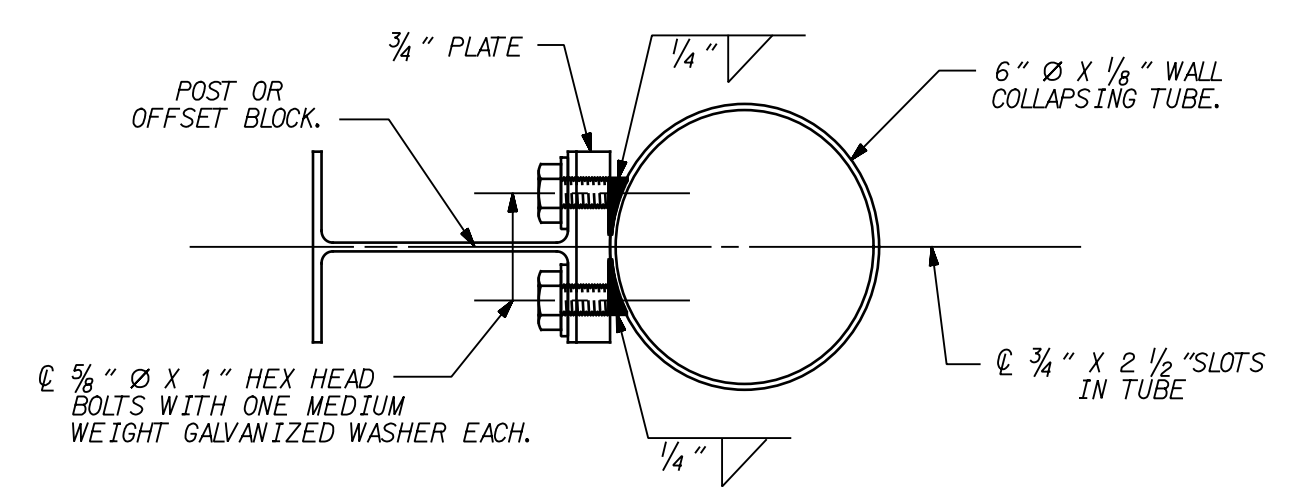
DETAILS FOR RETROFIT OF EXISTING BRIDGE RAIL WITH TUBULAR BEAM GUARDRAIL
